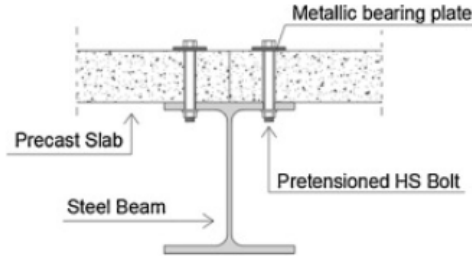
Steel concrete composite beam with HSFG bolts.
